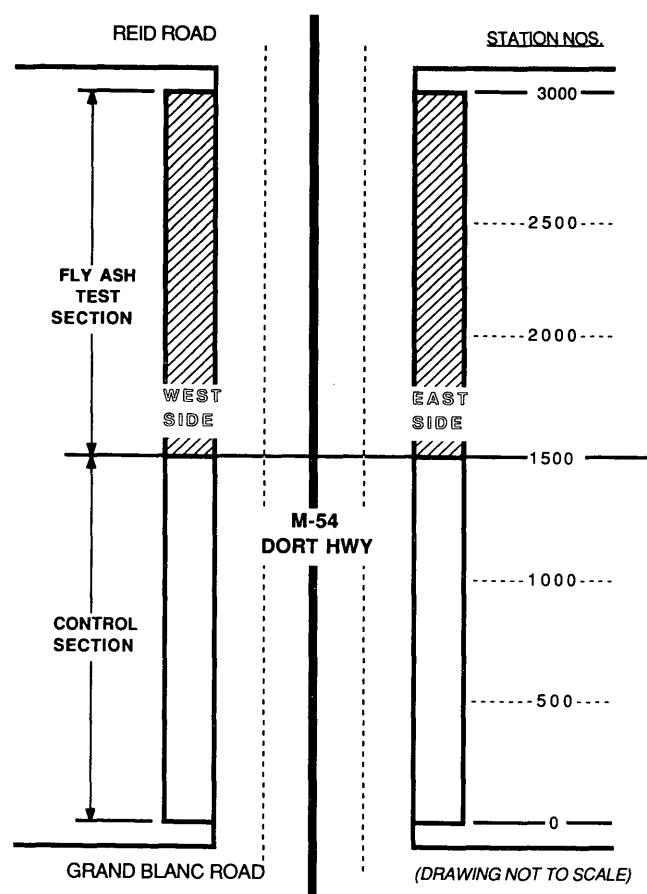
Schematic diagram showing plan and layout of road shoulder test.
